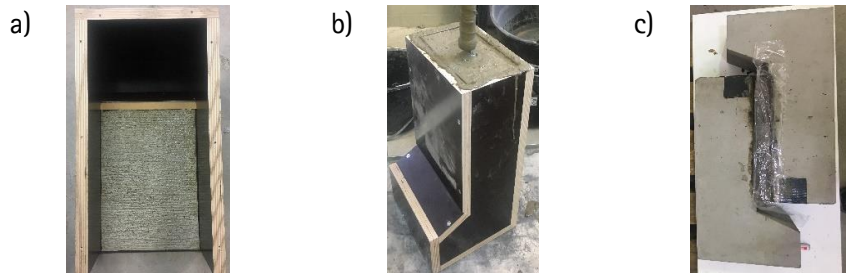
Manufacture of the specimen type D: a) formwork of the concrete part with silicone mould, b) casting of concrete part, c) casting of CAM
